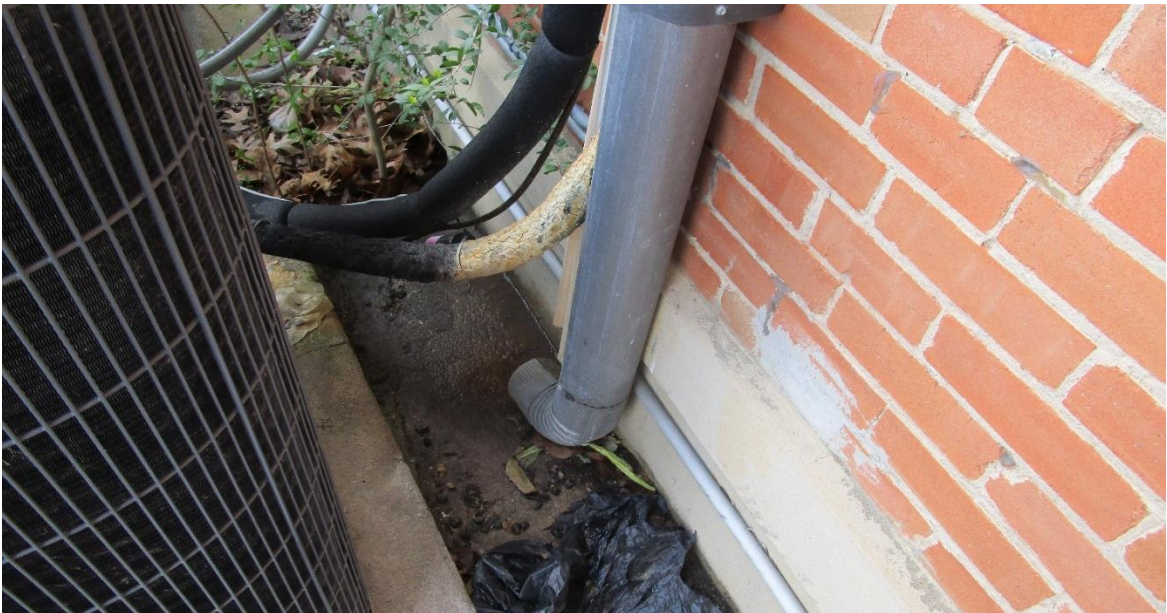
Downspout discharges water on the north side of the building behind the AC condensing unit. The AC condensate lines are discharging next the foundation as well. None of this water is directed away from the foundation.
